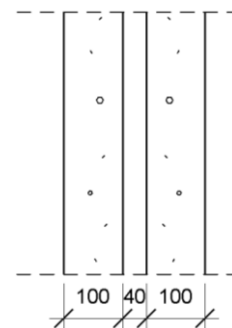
DESIGN 1 PREFAB CONCRETE
